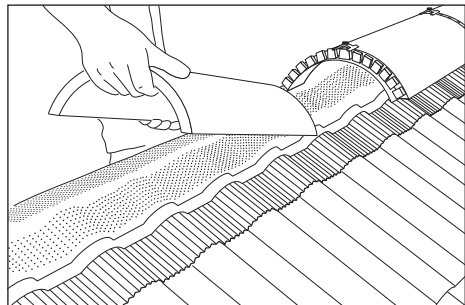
Ridge tiles laid with Universal RidgeFast unions
